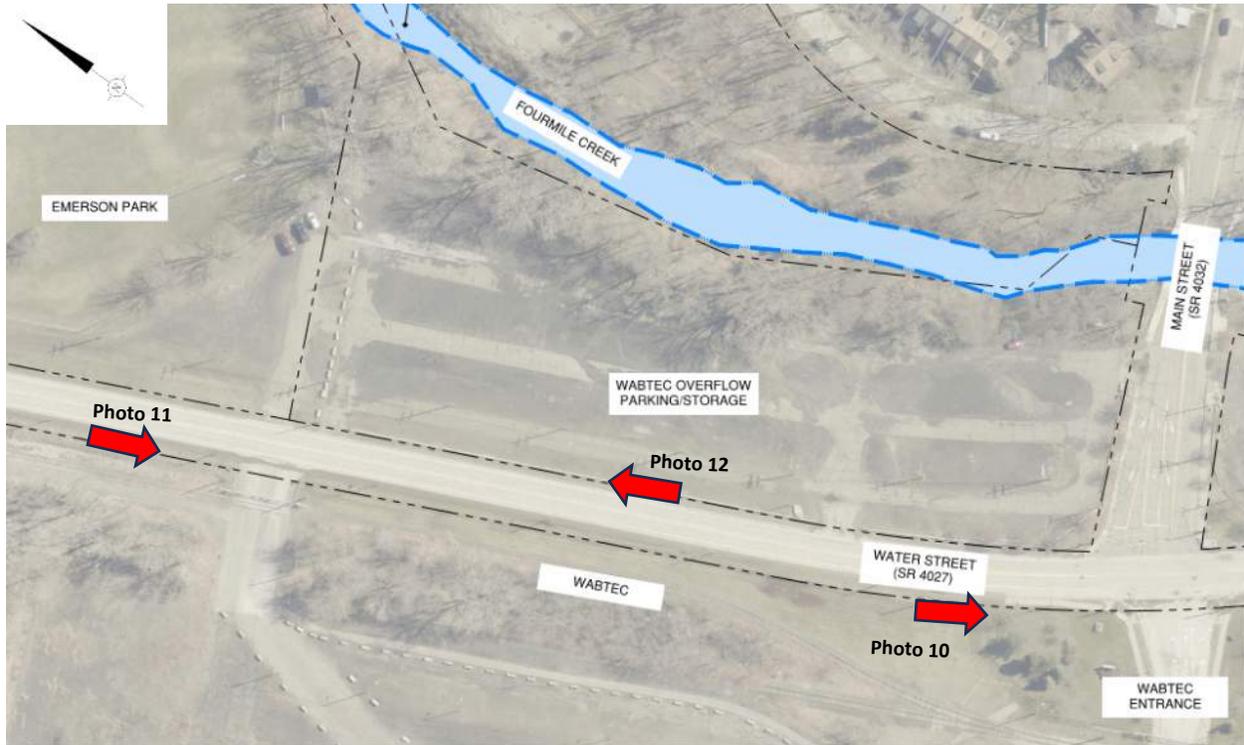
Existing conditions north of Main Street (SR 4032) (not to scale).
